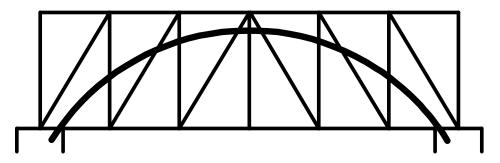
Schematic of Burr Arch-truss Covered Bridge
